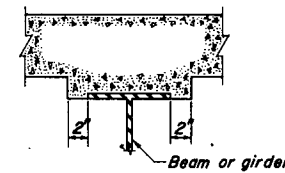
DETAIL AT TRANSVERSE CONSTR. JT'S. AND METAL INTERIOR DIAPHRAGMS
